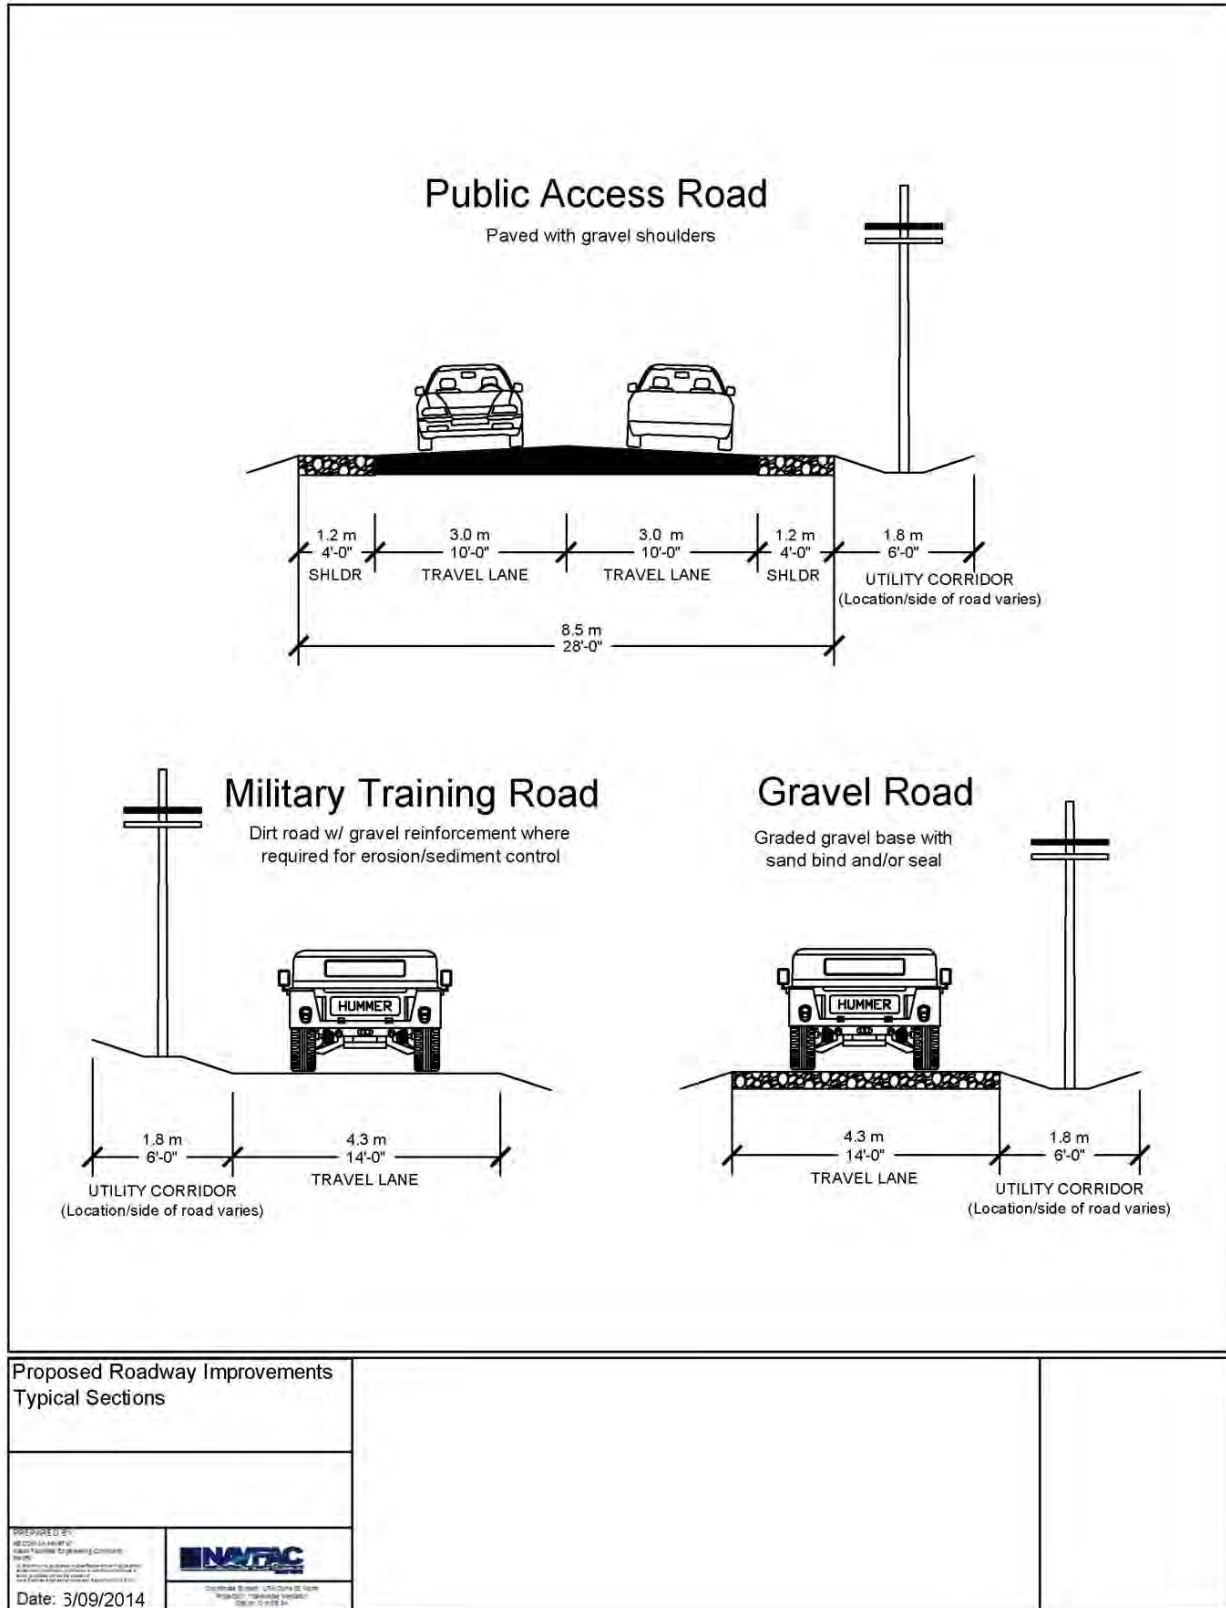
Proposed Roadway Improvements – Typical Sections
